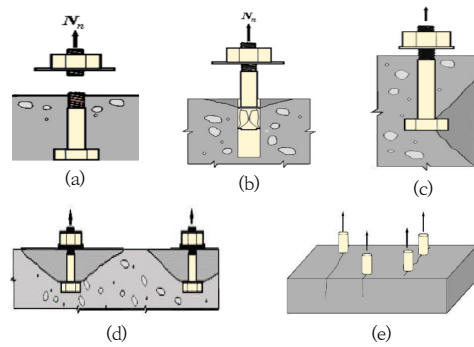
Failure mode of anchor bolt subjected to tension (a) Steel failure (b) Pullout (c) Side-face blowout (d) Concrete breakout (e) Concrete splitting
